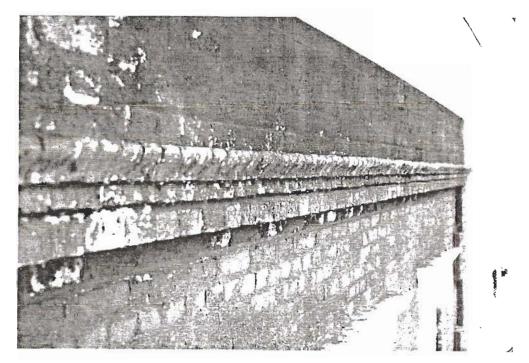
Brick Trim Detail Below Roof Cornice at East Facade.
